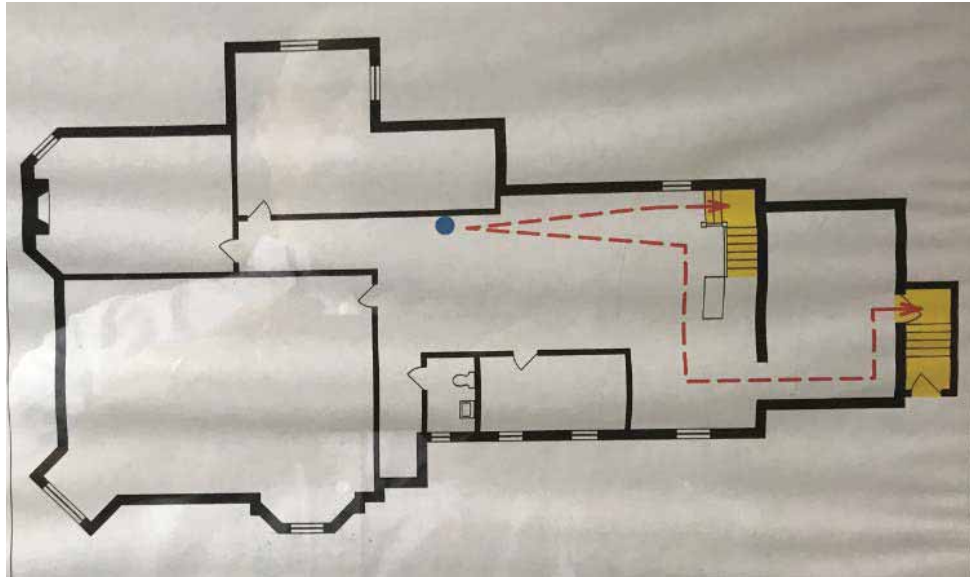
Building mounted egress basement floor plan diagram (N.T.S.)
